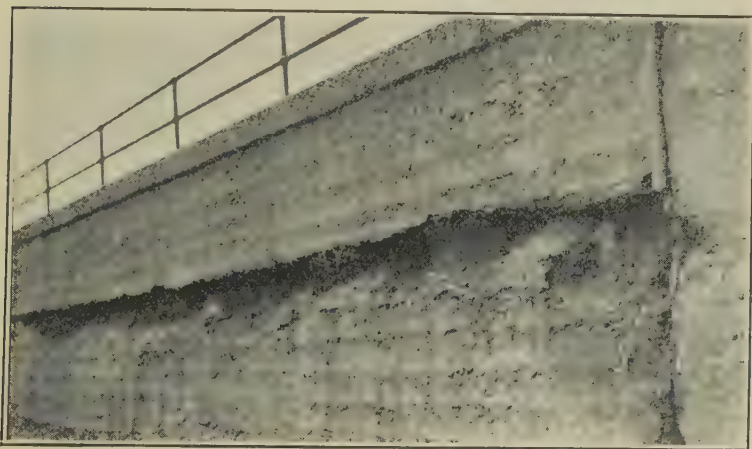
THE CONCRETE AT THE TOP OF THE LOWER "LIFT" IN THIS WALL HAS DISINTEGRATED IN PLACES TO A DEPTH OF 16 IN. Note how conspicuously the failing concrete is confined to the top two feet of the affected section.
